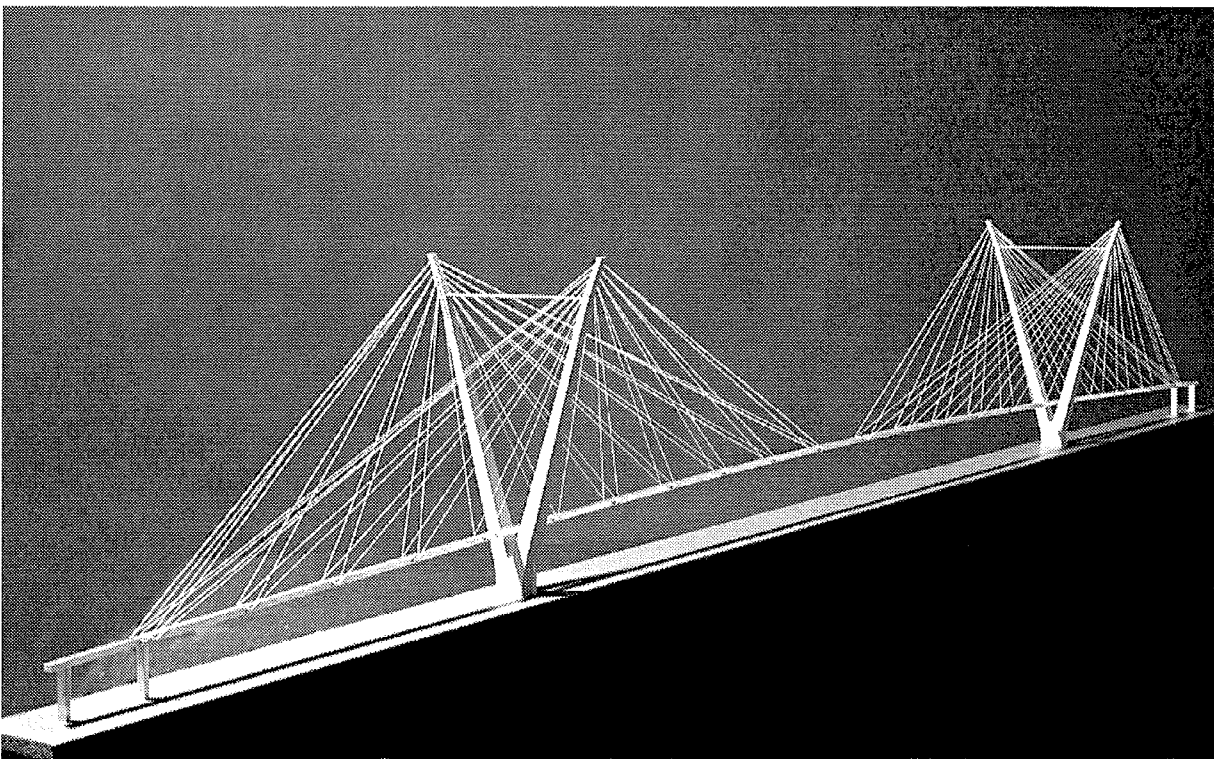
Architectural model of a cable-stayed bridge having a spatial cable system.
